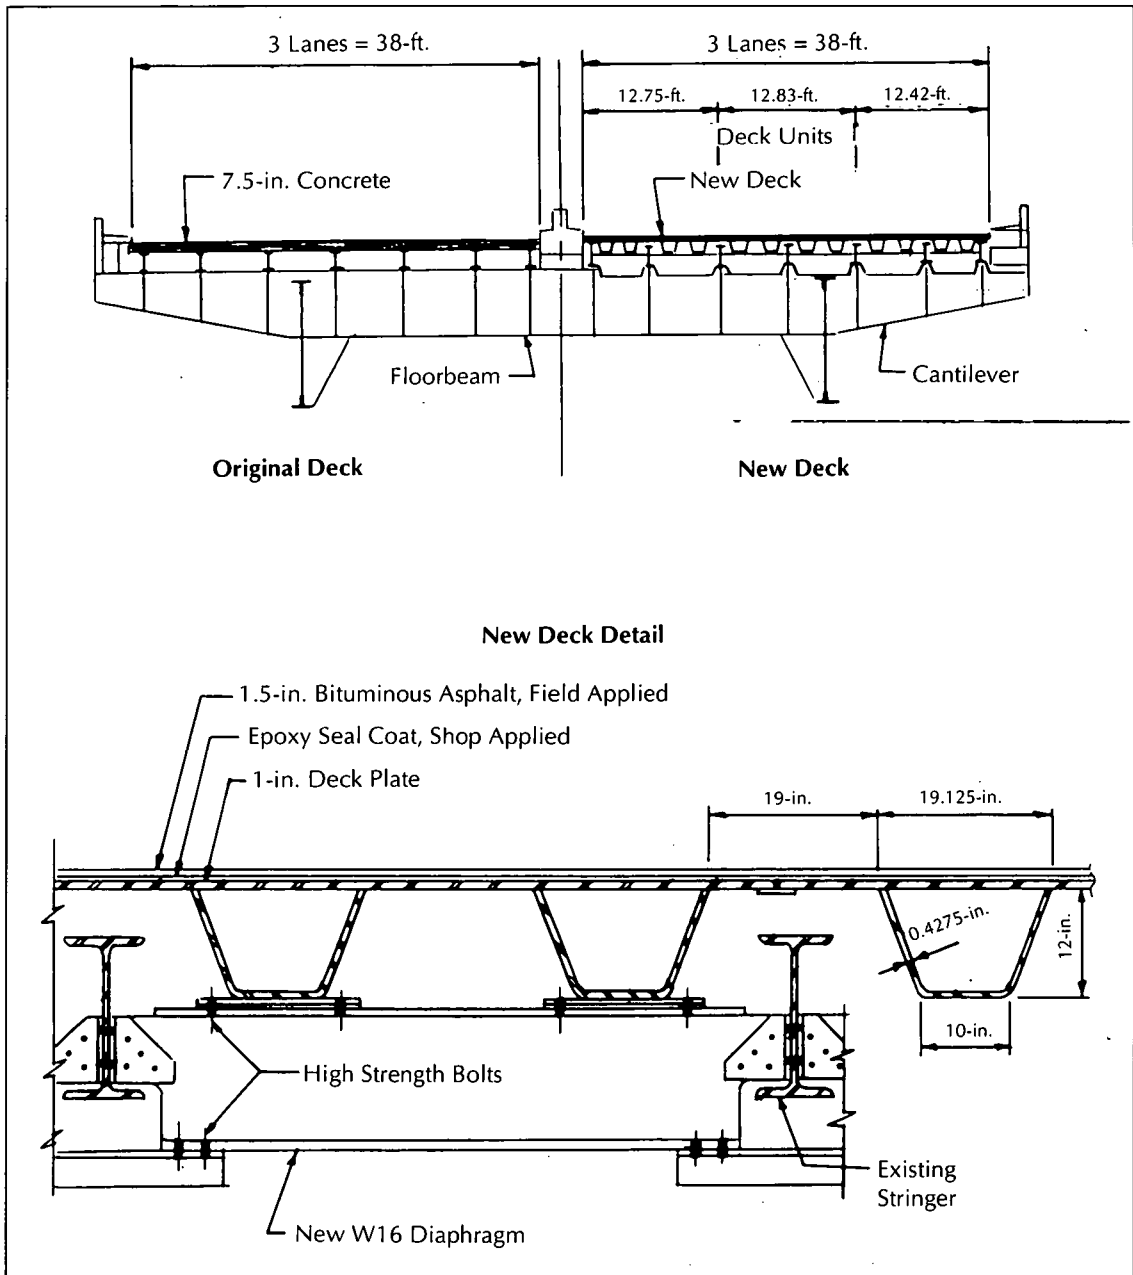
The orthotropic steel deck for the Throgs Neck Bridge.
